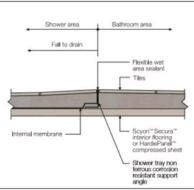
UNENCLOSED SHOWER - EDGE FINISHING DETAIL
